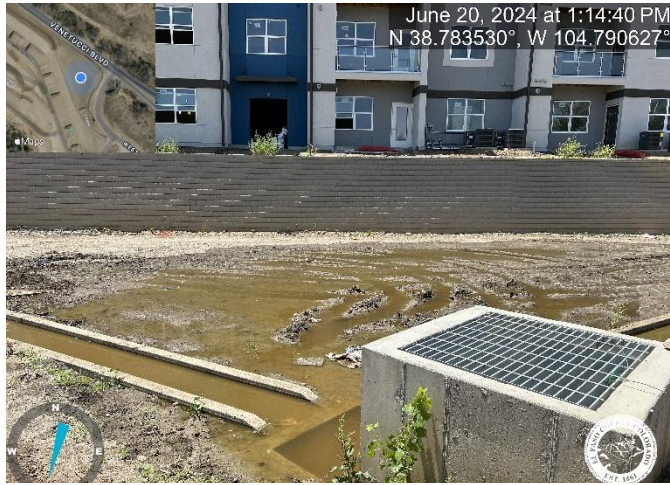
Fill in low spot near south outlet structure to allow positive drainage.
